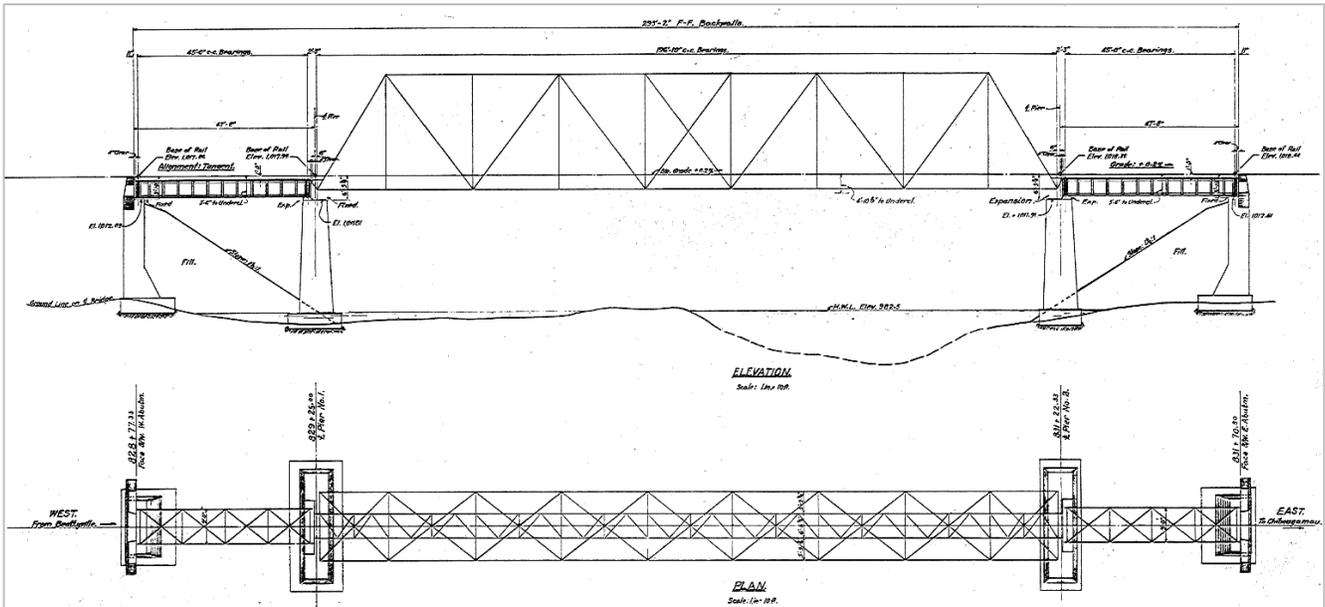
Plan and elevation views of the PK 125.30 Chapais bridge
